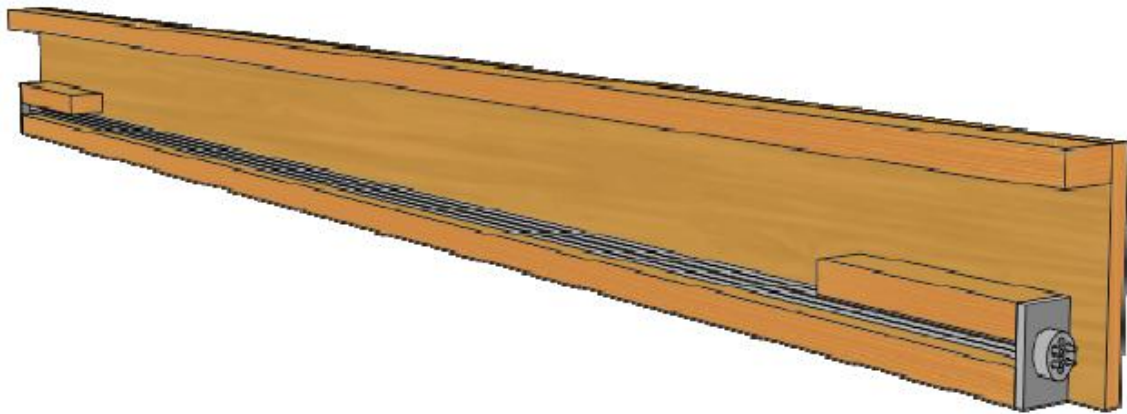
Longitudinal section of timber box beams with straight post-tensioning tendons (van Beerschoten et al., 2012).
